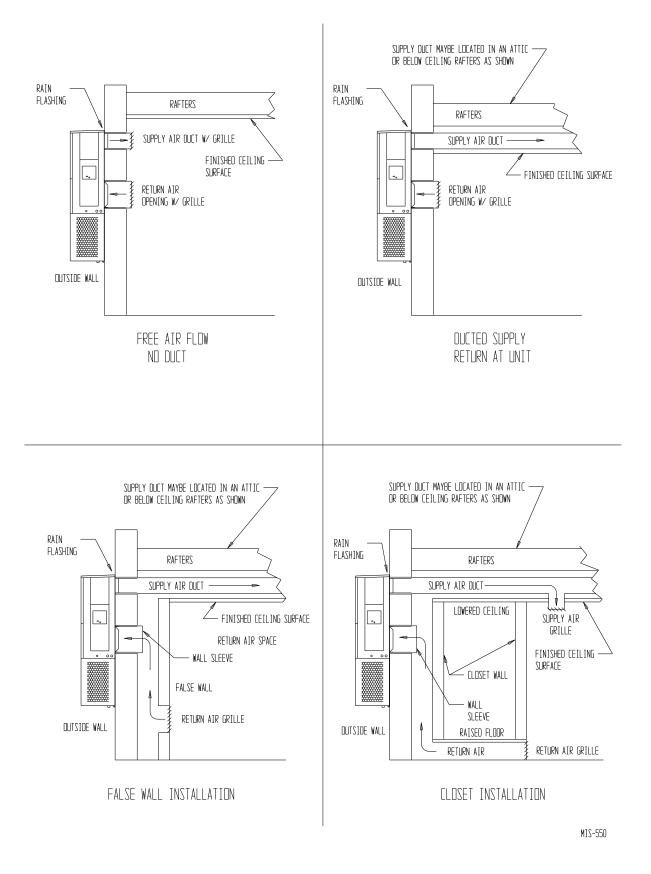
WALL MOUNTING INSTRUCTIONS
